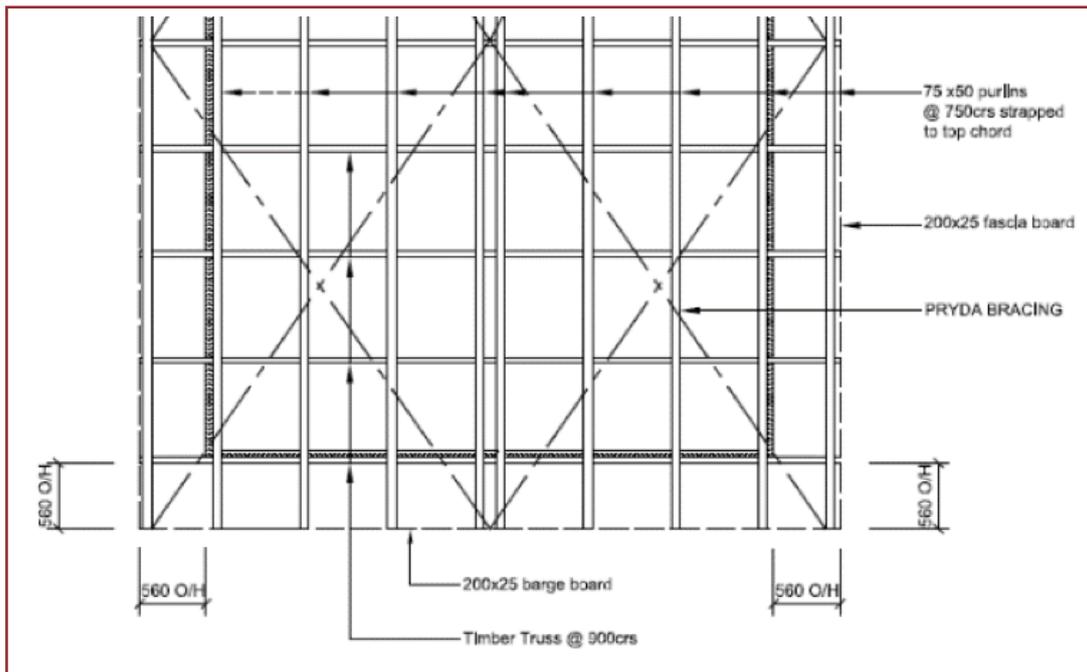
Roof bracing diagram (Source: Fiji Rural Housing Unit)
